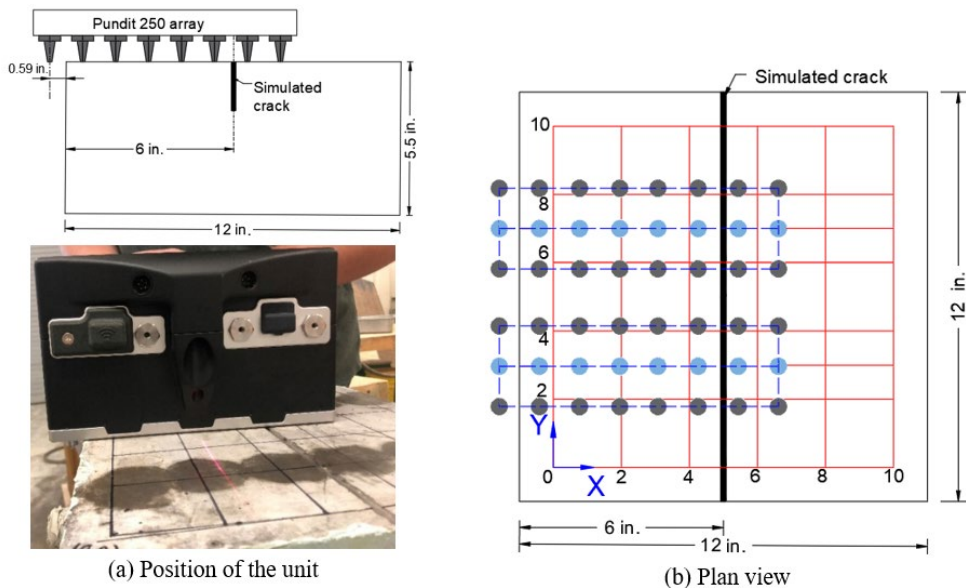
Arrangement-2: Excitation direction parallel to the crack and the unit placed offset from the crack
